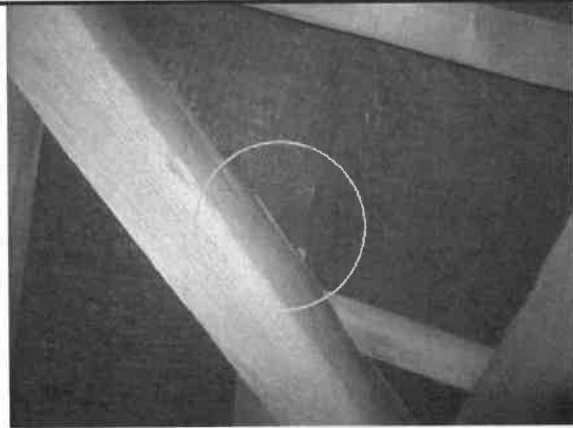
Minor damage at undertile roof felt with droppings beneath (possible roof void / roost access point to Roost 2)
